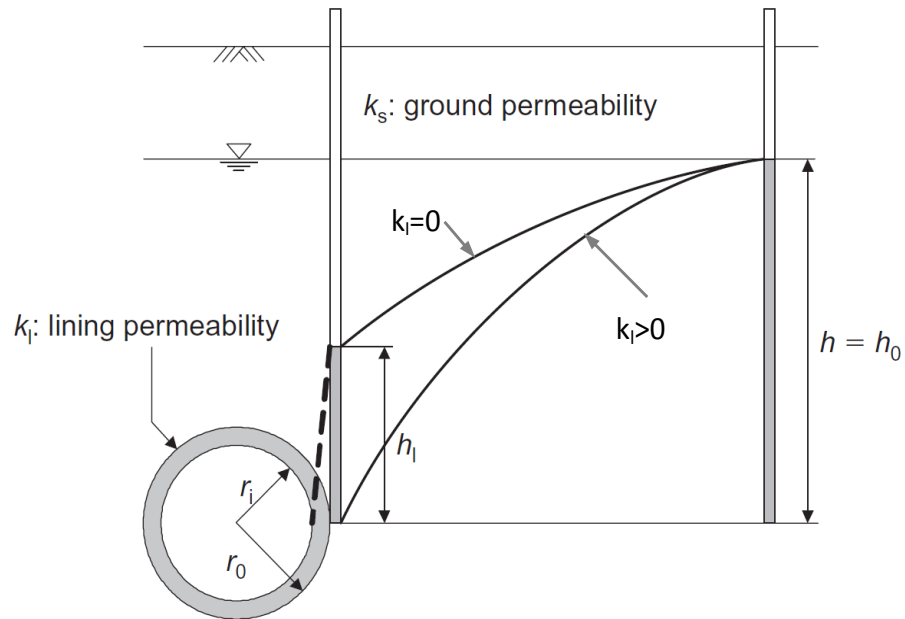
Influence of tunnel lining permeability on the hydraulic gradients in the surrounding soil (From Shin, 2010). Higher hydraulic head, h_l , observed with fully waterproofed tunnel lining.
